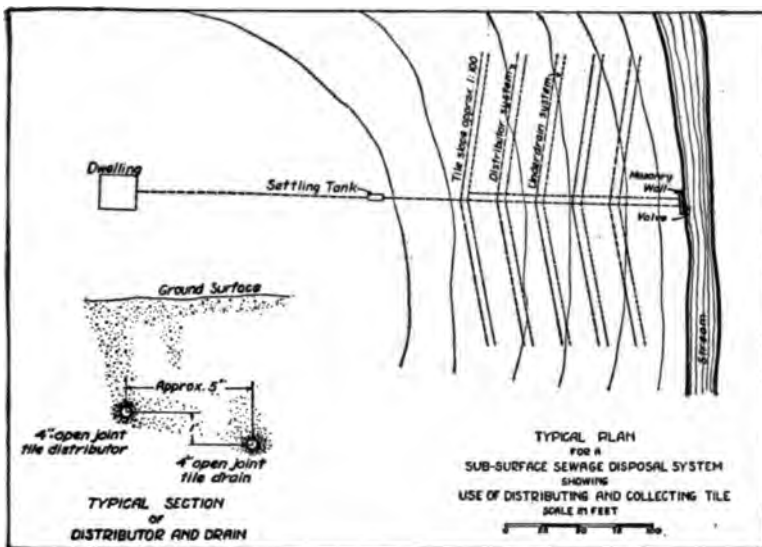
Typical plan for a subsurface sewage disposal system for domestic installation. (After Hansen: *Illinois Health News*.)
